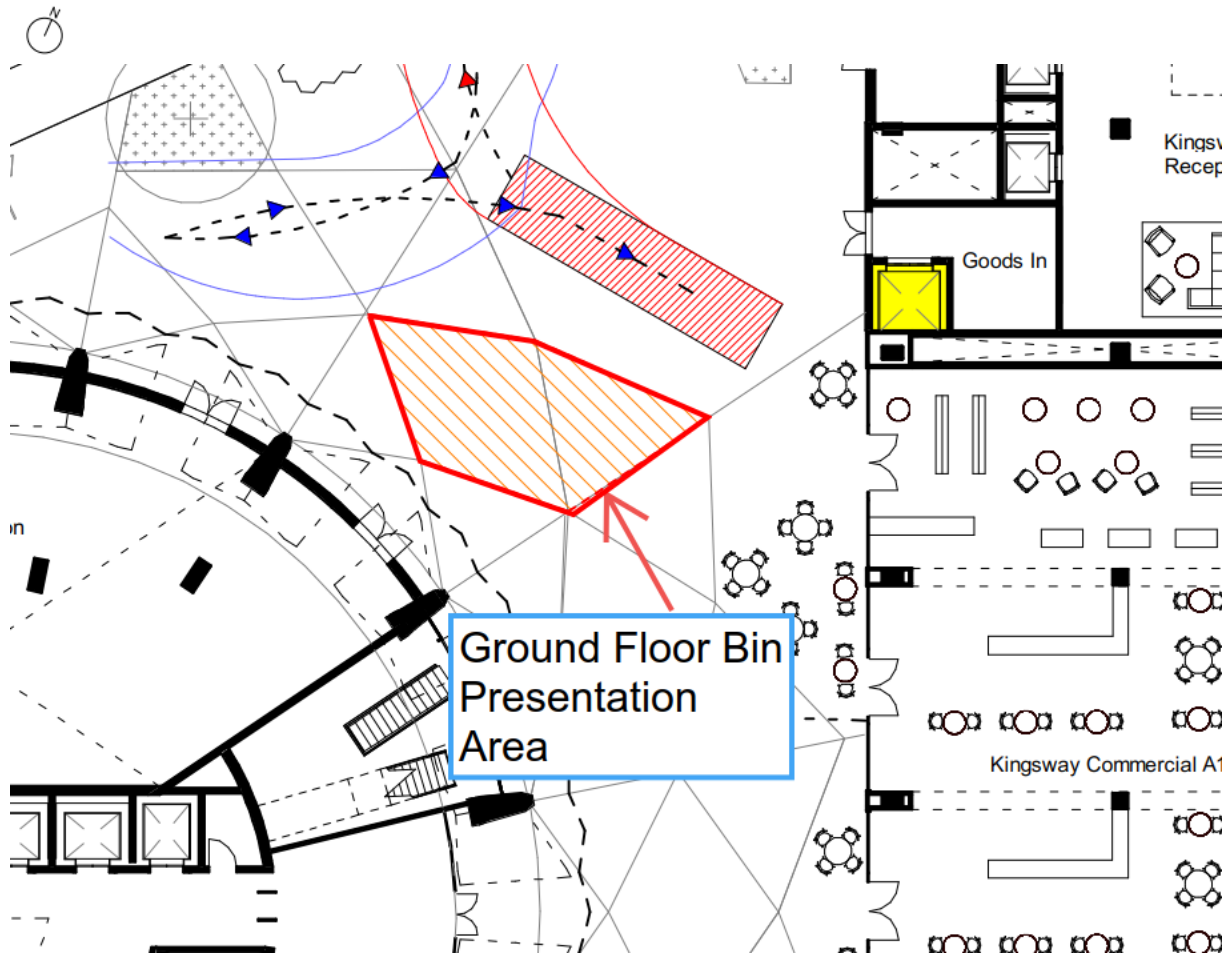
Location of Ground Floor Lift (Used during collection)
